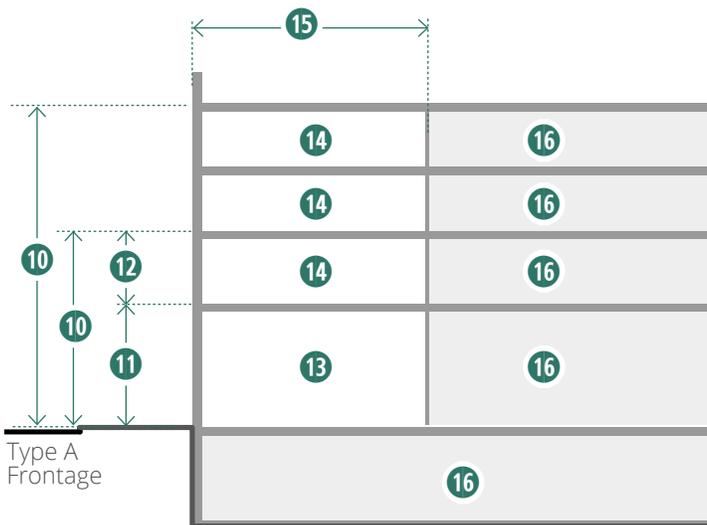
(3). Storefront Building Section: Height & Use Requirements
